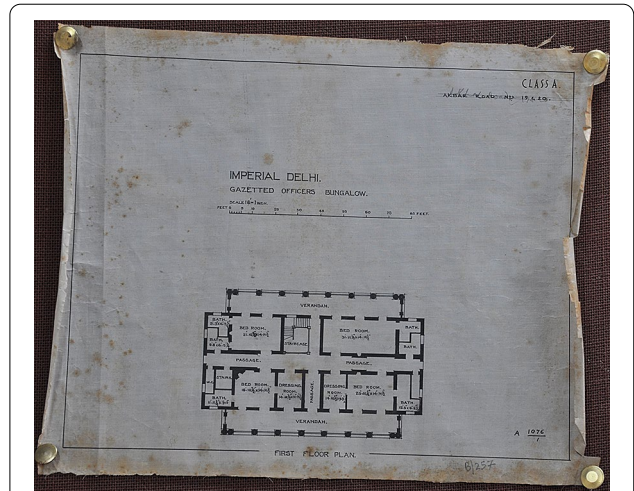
Gazetted officer's bungalow class A, Delhi (first floor plan) c. 1935–9 (Archive CPWD/INTACH; image property: Pilar Maria Guerrieri)
